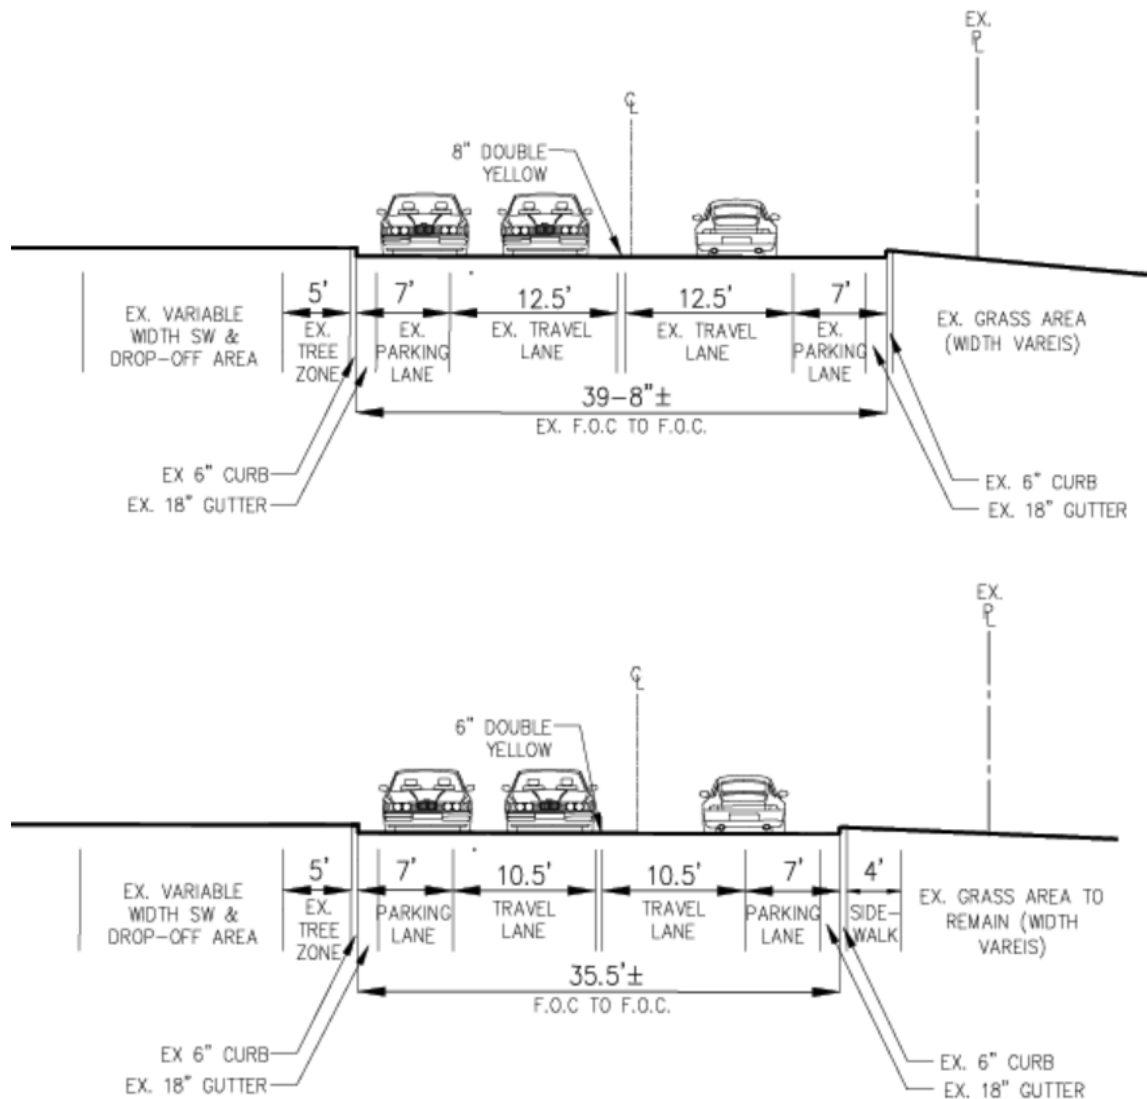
Existing (top) and Proposed (bottom) North Troy Street Cross-section
